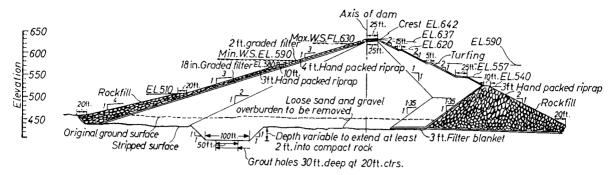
Typical section where depth of water exceeds 120 ft—Hirakud Earth Dam
